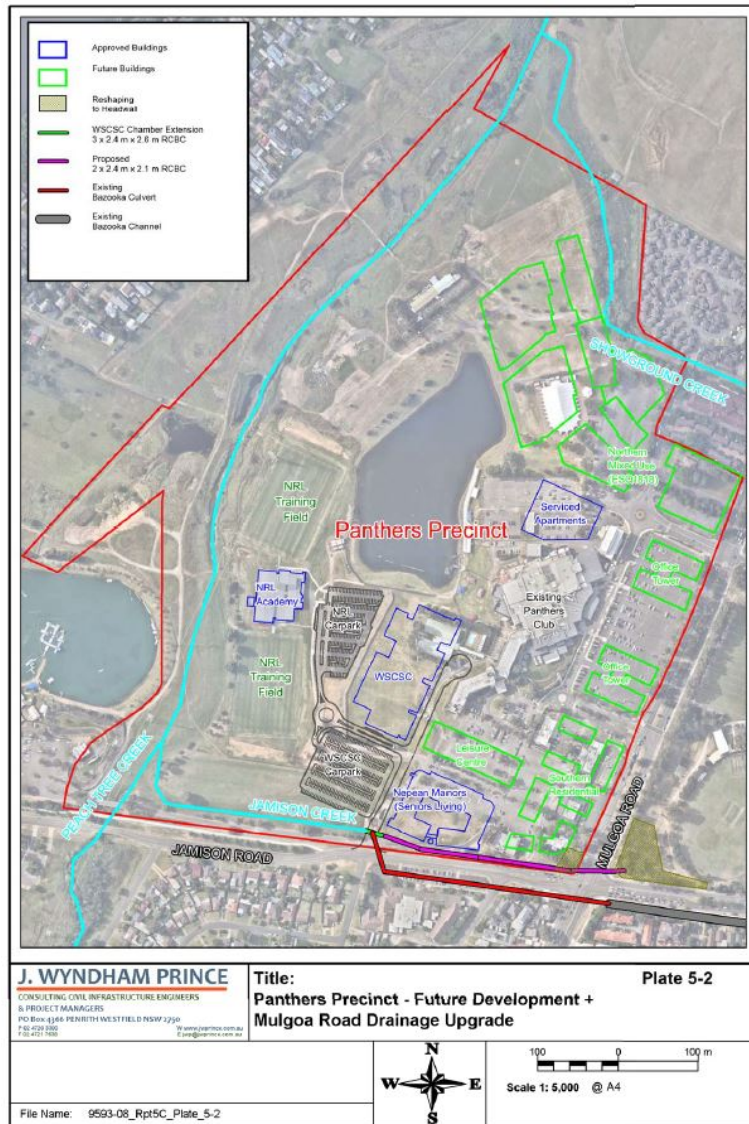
Proposed drainage upgrades at the Mulgoa Rd and Jamison Rd intersection (JWP, 2016)
